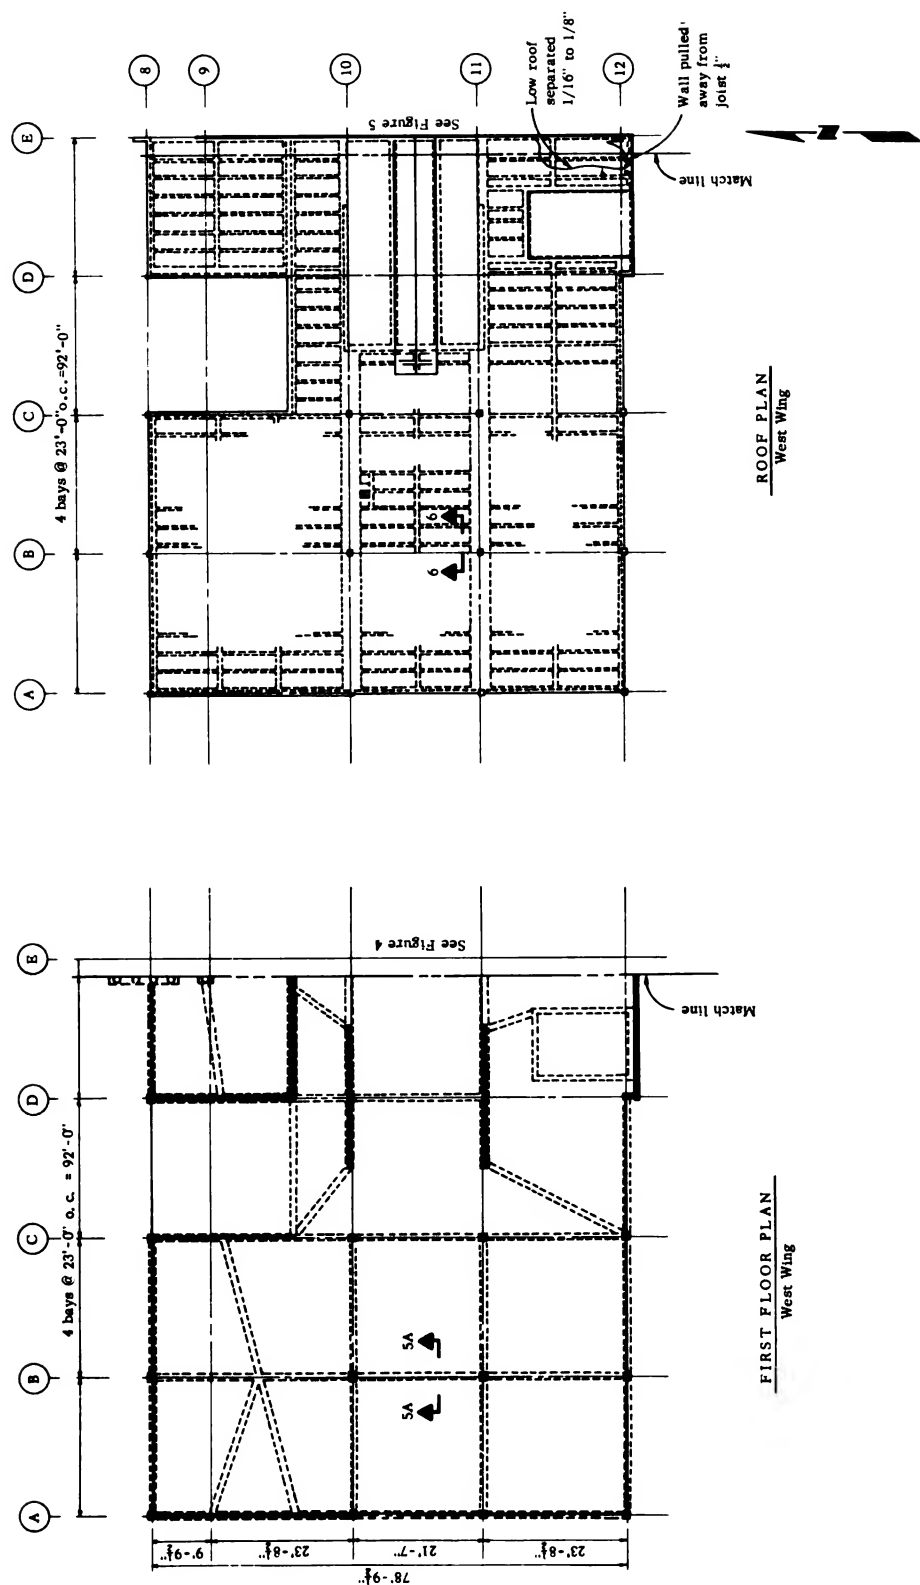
Holy Cross Hospital. Framing plans, west wing.
